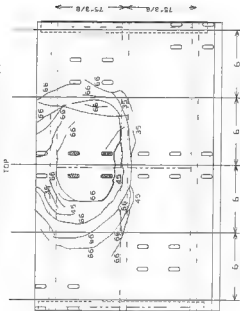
Top Cracking Pattern (Fourth Bridge - Test No 1)
